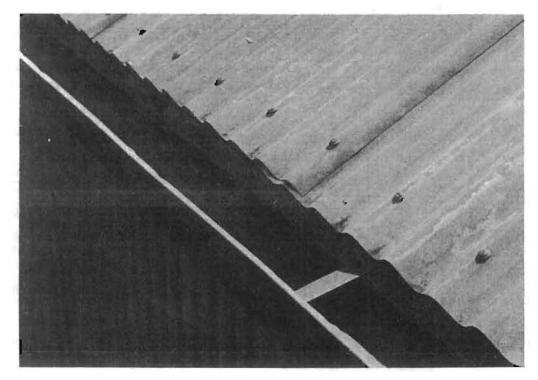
The lower ends of the roof sheeting at the gutter line.
